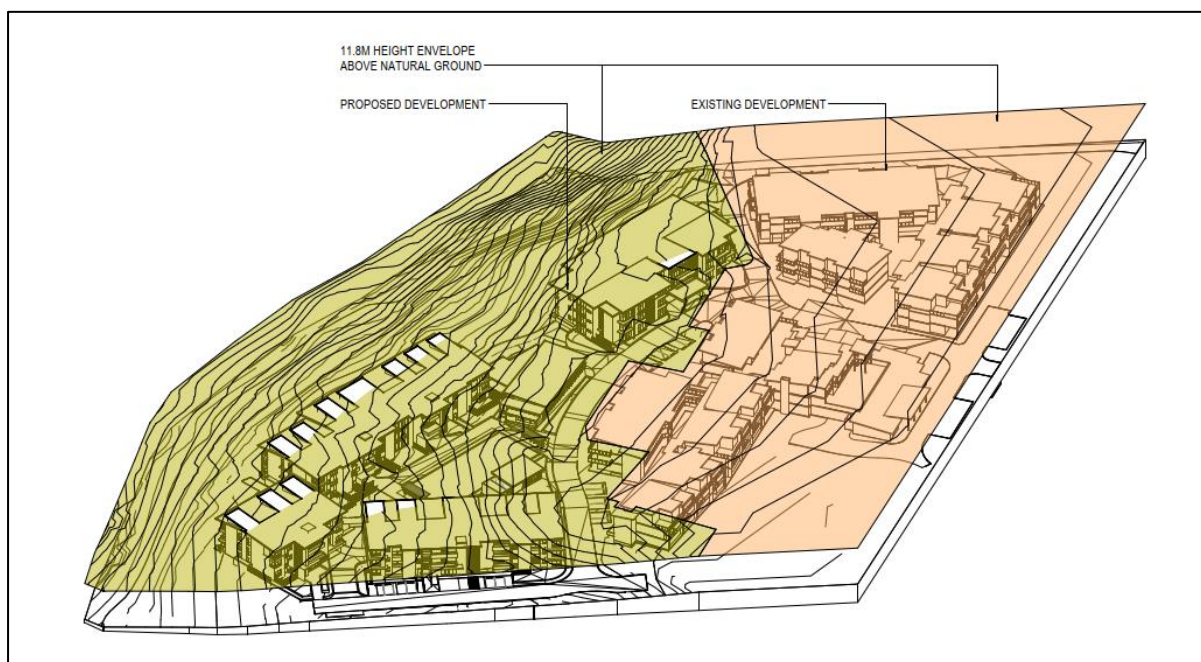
Aerial View – 11.8m Building Height Envelope (Source: Arqus Design)
